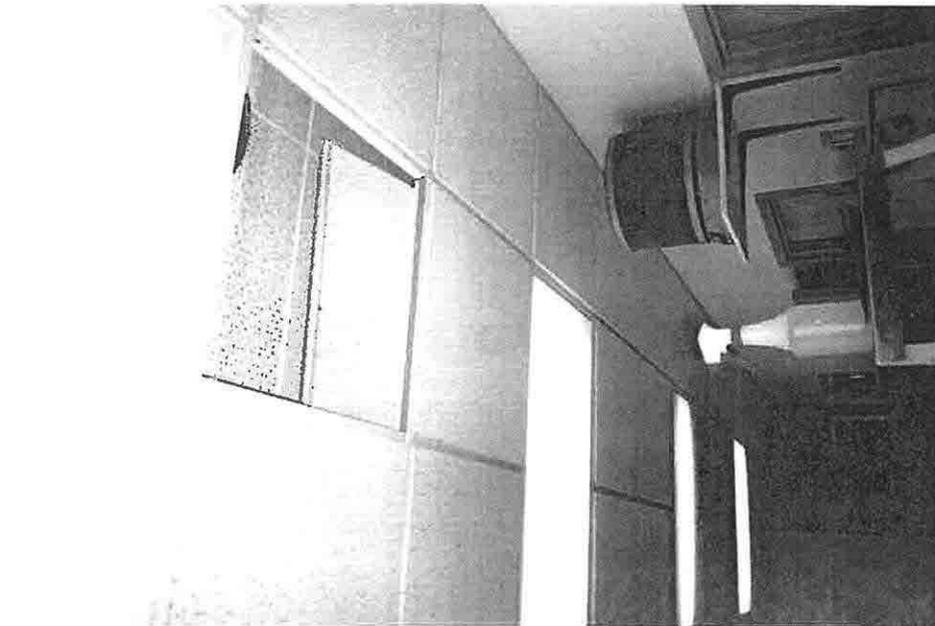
Room 234.0, Transite Vent Pipe for Lab Hood Above Ceiling
